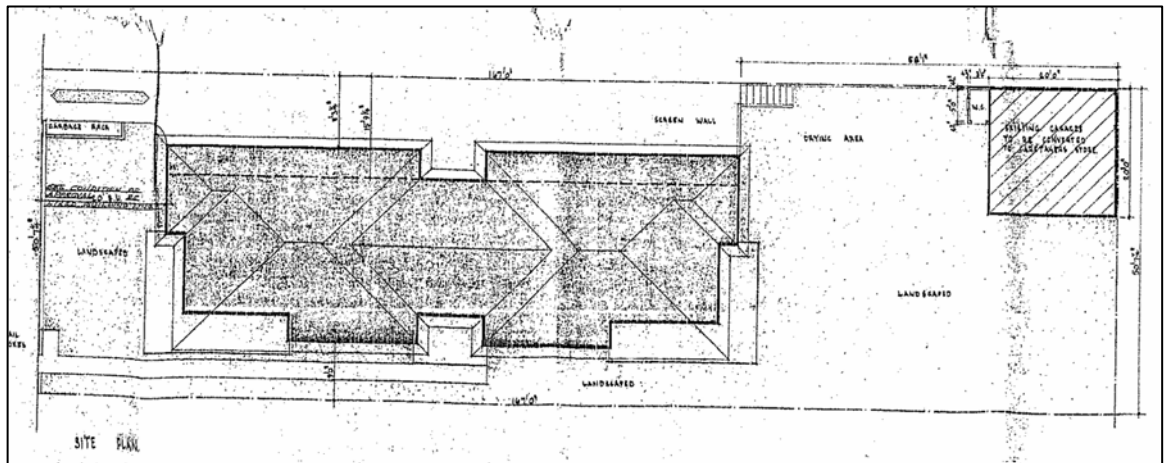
Approved site plan for 1097/71 showing the existing garages in the south-east corner of the site to be converted into a caretaker's store. The site plan shows that the existing garages were not approved for use as car parking (Approved Plans 1097/71).
